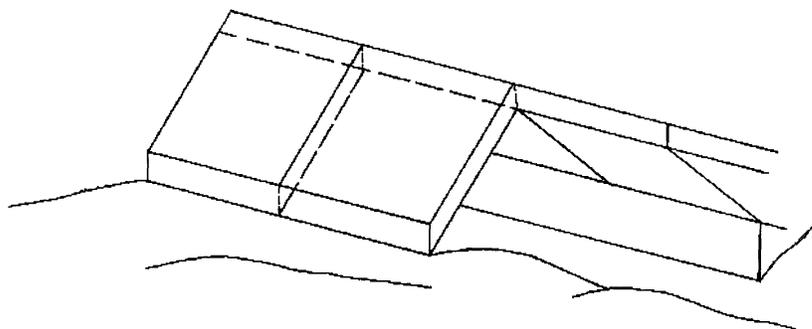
Snow Trench Construction. Continue placement of blocks for roof. Close one end with a block, use other end as an entrance.
